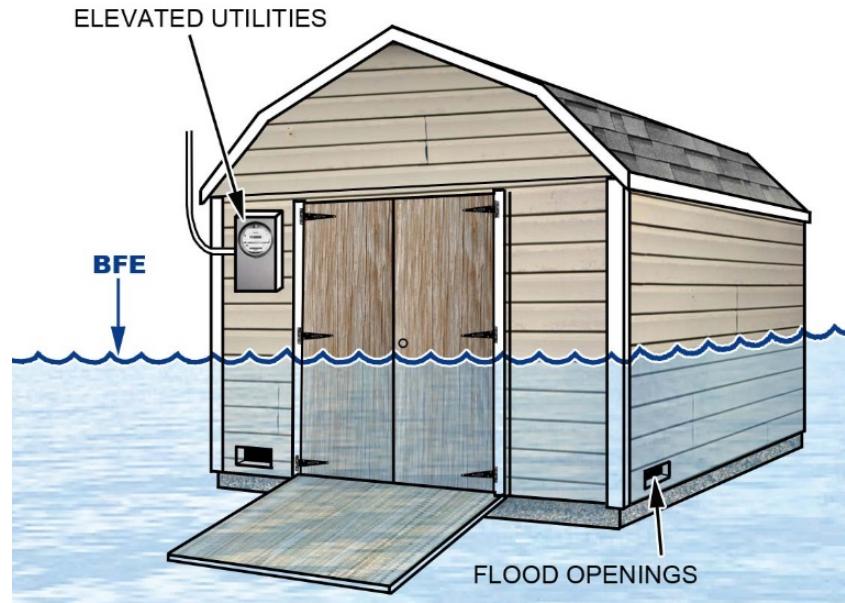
Accessory structure with flood openings and utilities elevated above the BFE
